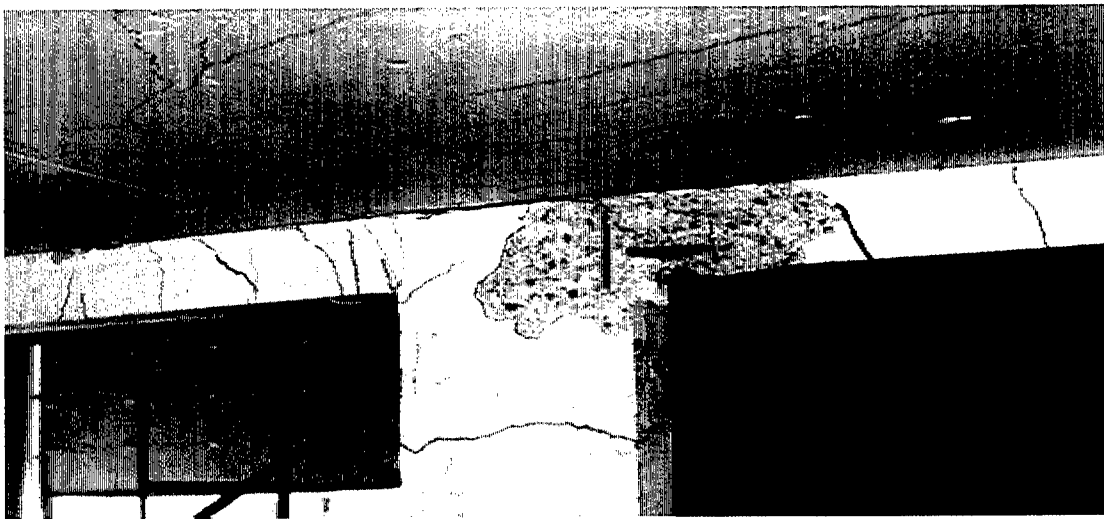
Bottom of Second Floor Slab and Spandrel, SW Column, Post-E200N
